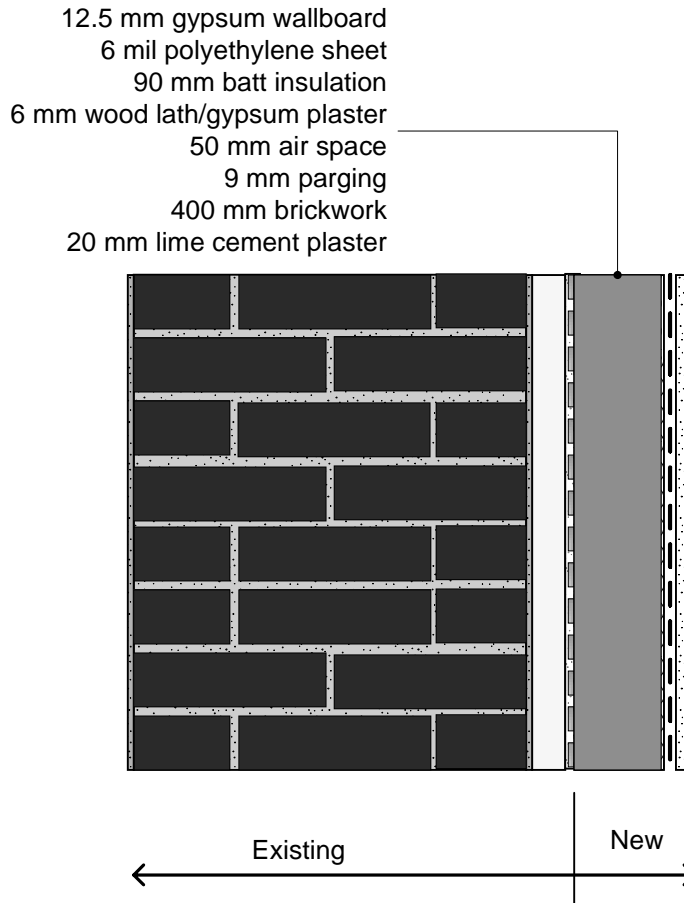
Wall NW1 (note plaster and thicker masonry)
